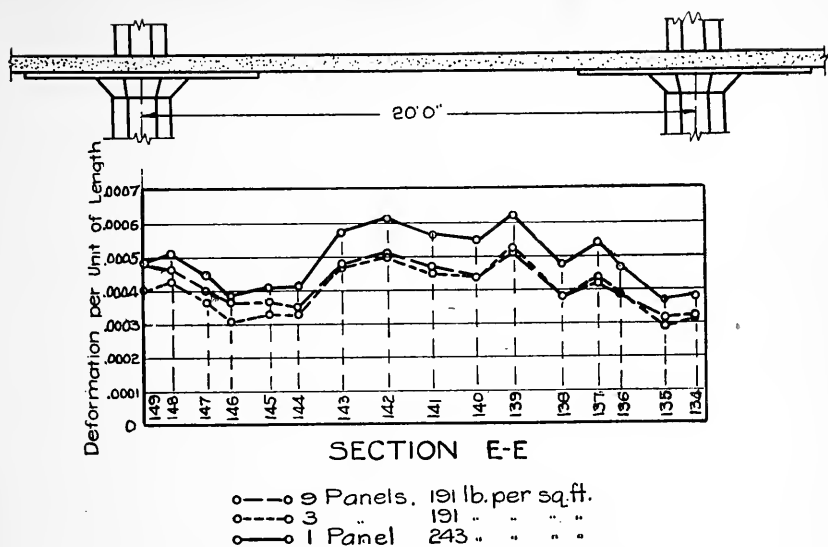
EAST-WEST DISTRIBUTION OF DEFORMATION IN NORTH-SOUTH BARS ACROSS CENTER LINE OF CENTRAL TEST PANEL IN SHREDDED WHEAT FACTORY.
